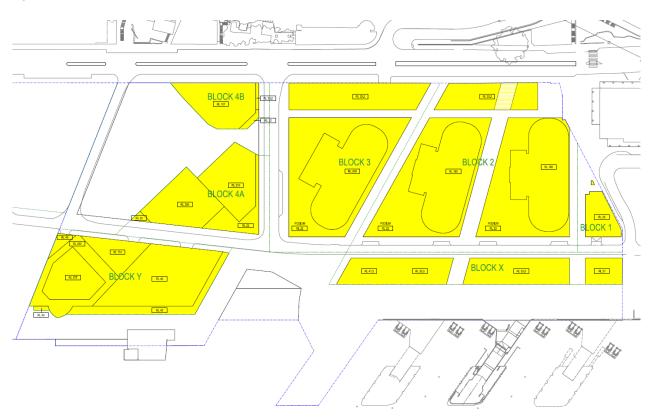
Concept Plan (Mod 8) Building Envelope Plan
